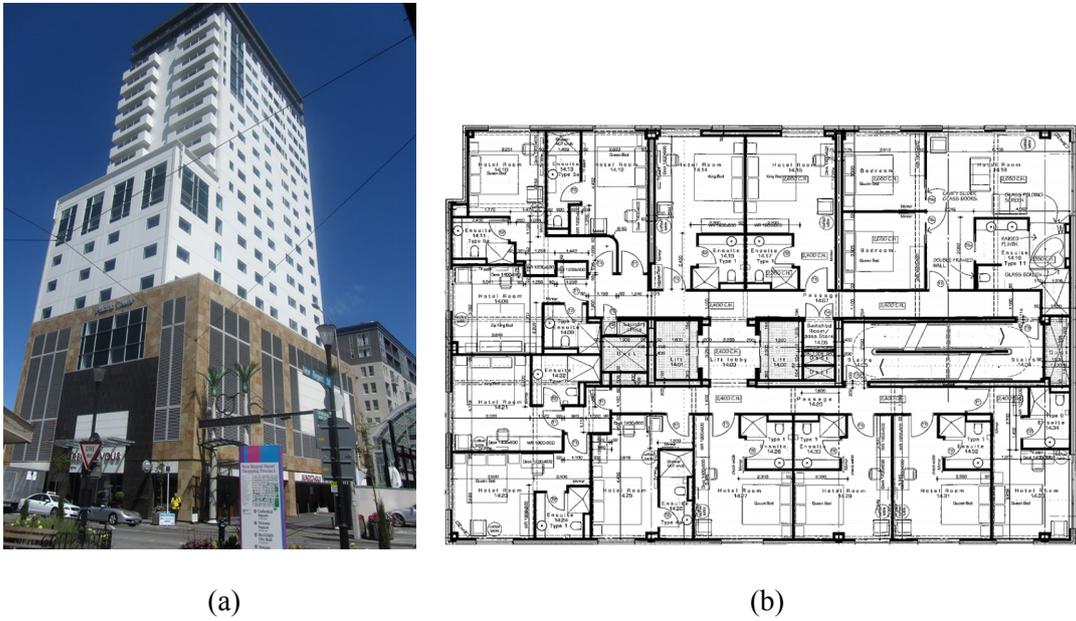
(a) Photo of 22-storey case study building from street level, (b) architectural plan from level 14.
